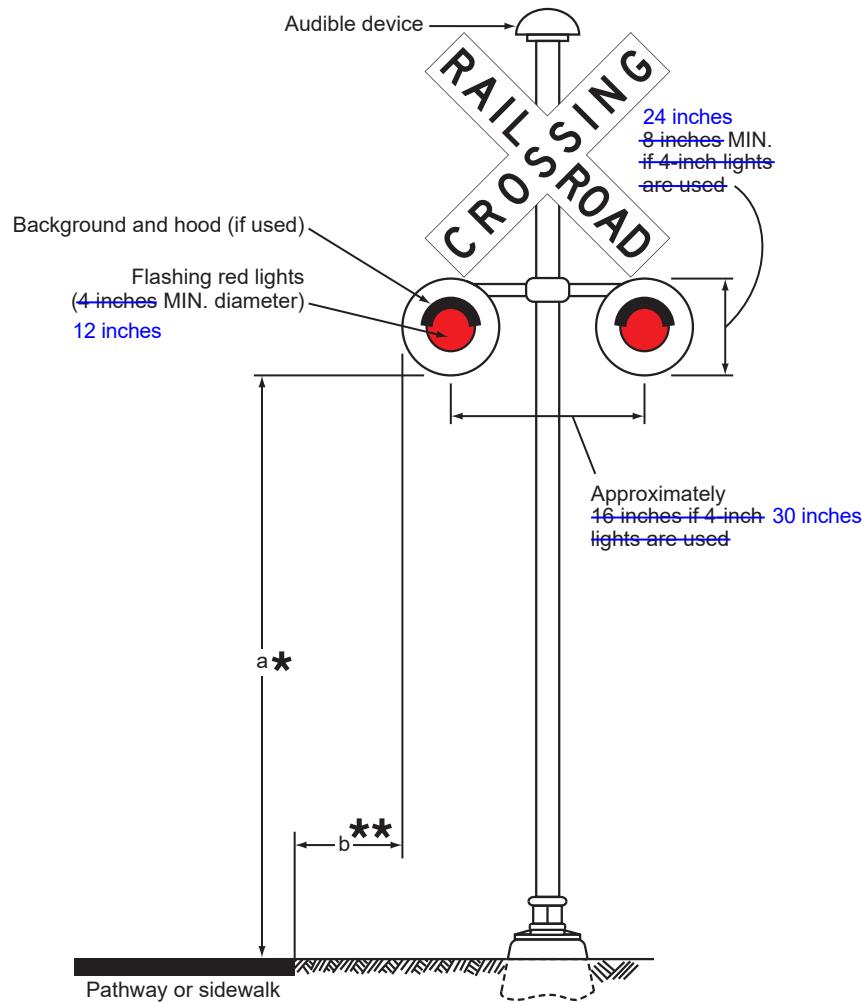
E-7. Example of a Flashing-Light Signal Assembly at a Pathway or Sidewalk Grade Crossing
